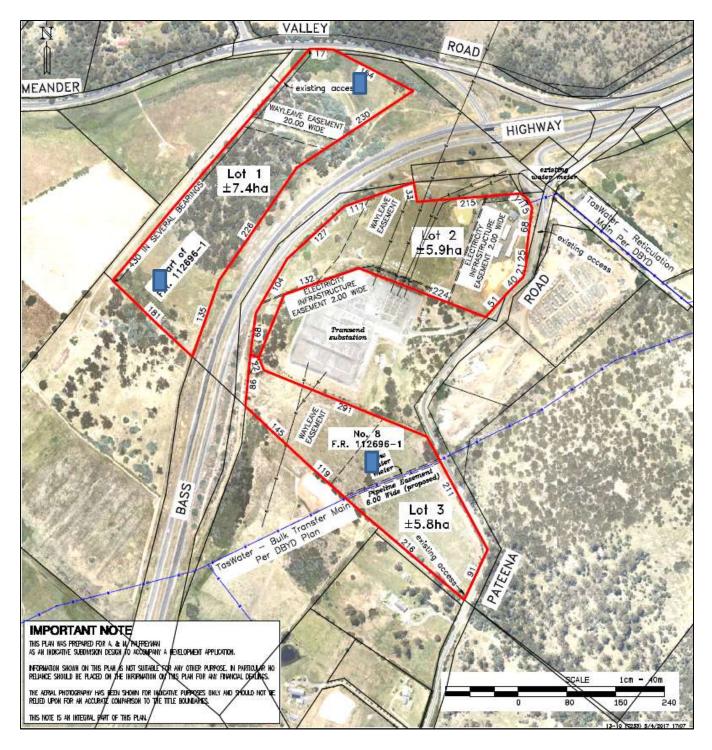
Excerpt from Draft Plan of Subdivision, Ref: 13-10(7320) Version A, dated 05-04-2017, Cohen & Associates; potential house sites shown as blue rectangles
